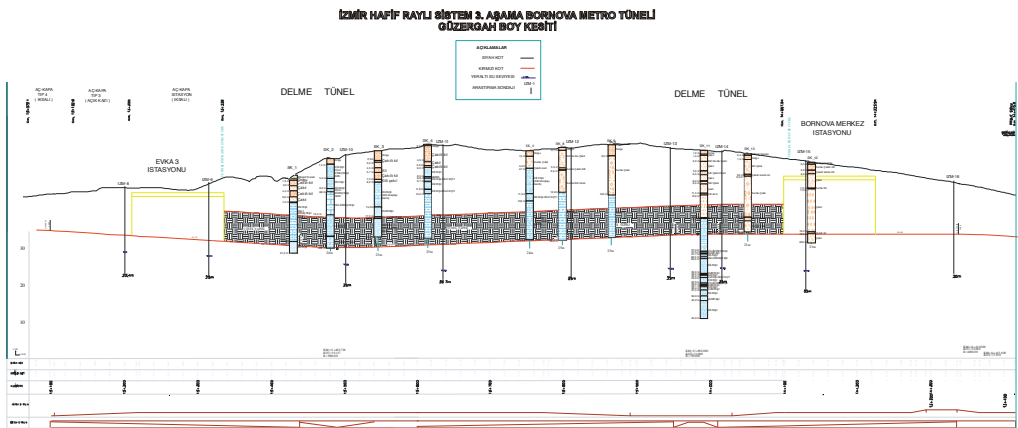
Longitudinal crosssections of the boreholes drilled for Bornova Metro Tunnel Project.
